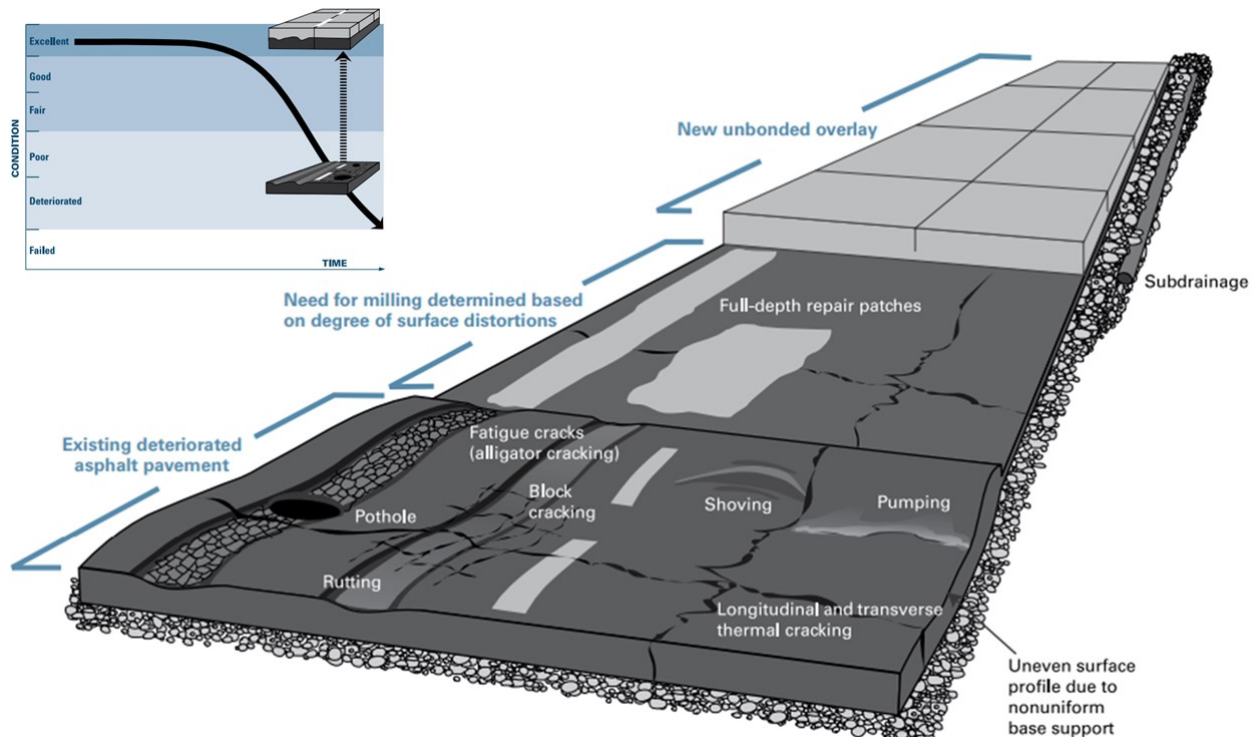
UBCOA of poor condition concrete pavement with surface distresses (Harrington et al. 2014)
